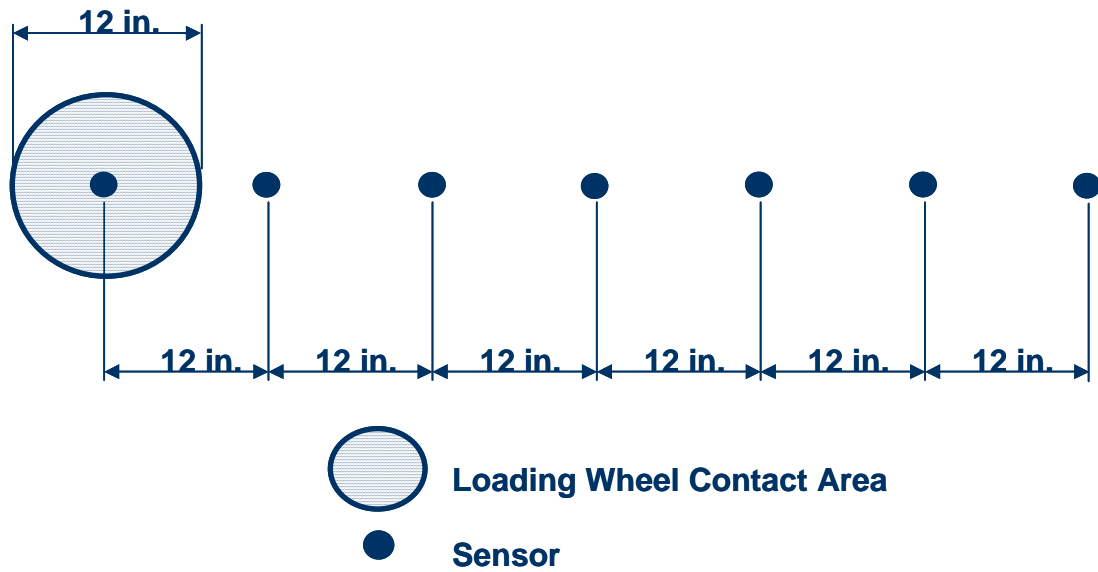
Plan layout of the FWD test showing loading location and position of sensors.
